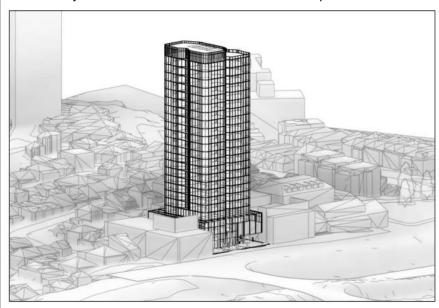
Proposed concept along Alfred Street (source: Urban Design Report)
